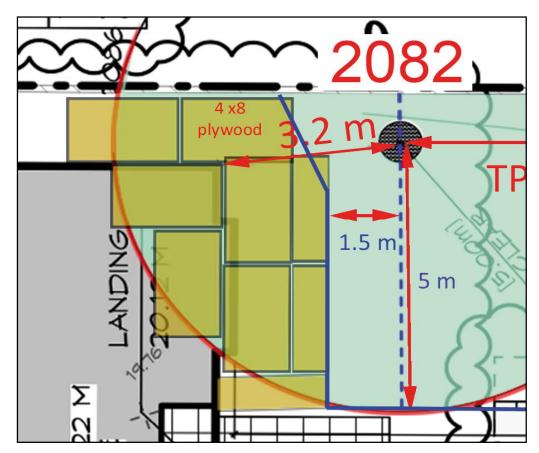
Conceptual layout of plywood beyond fence, and under grade beam and slab.
